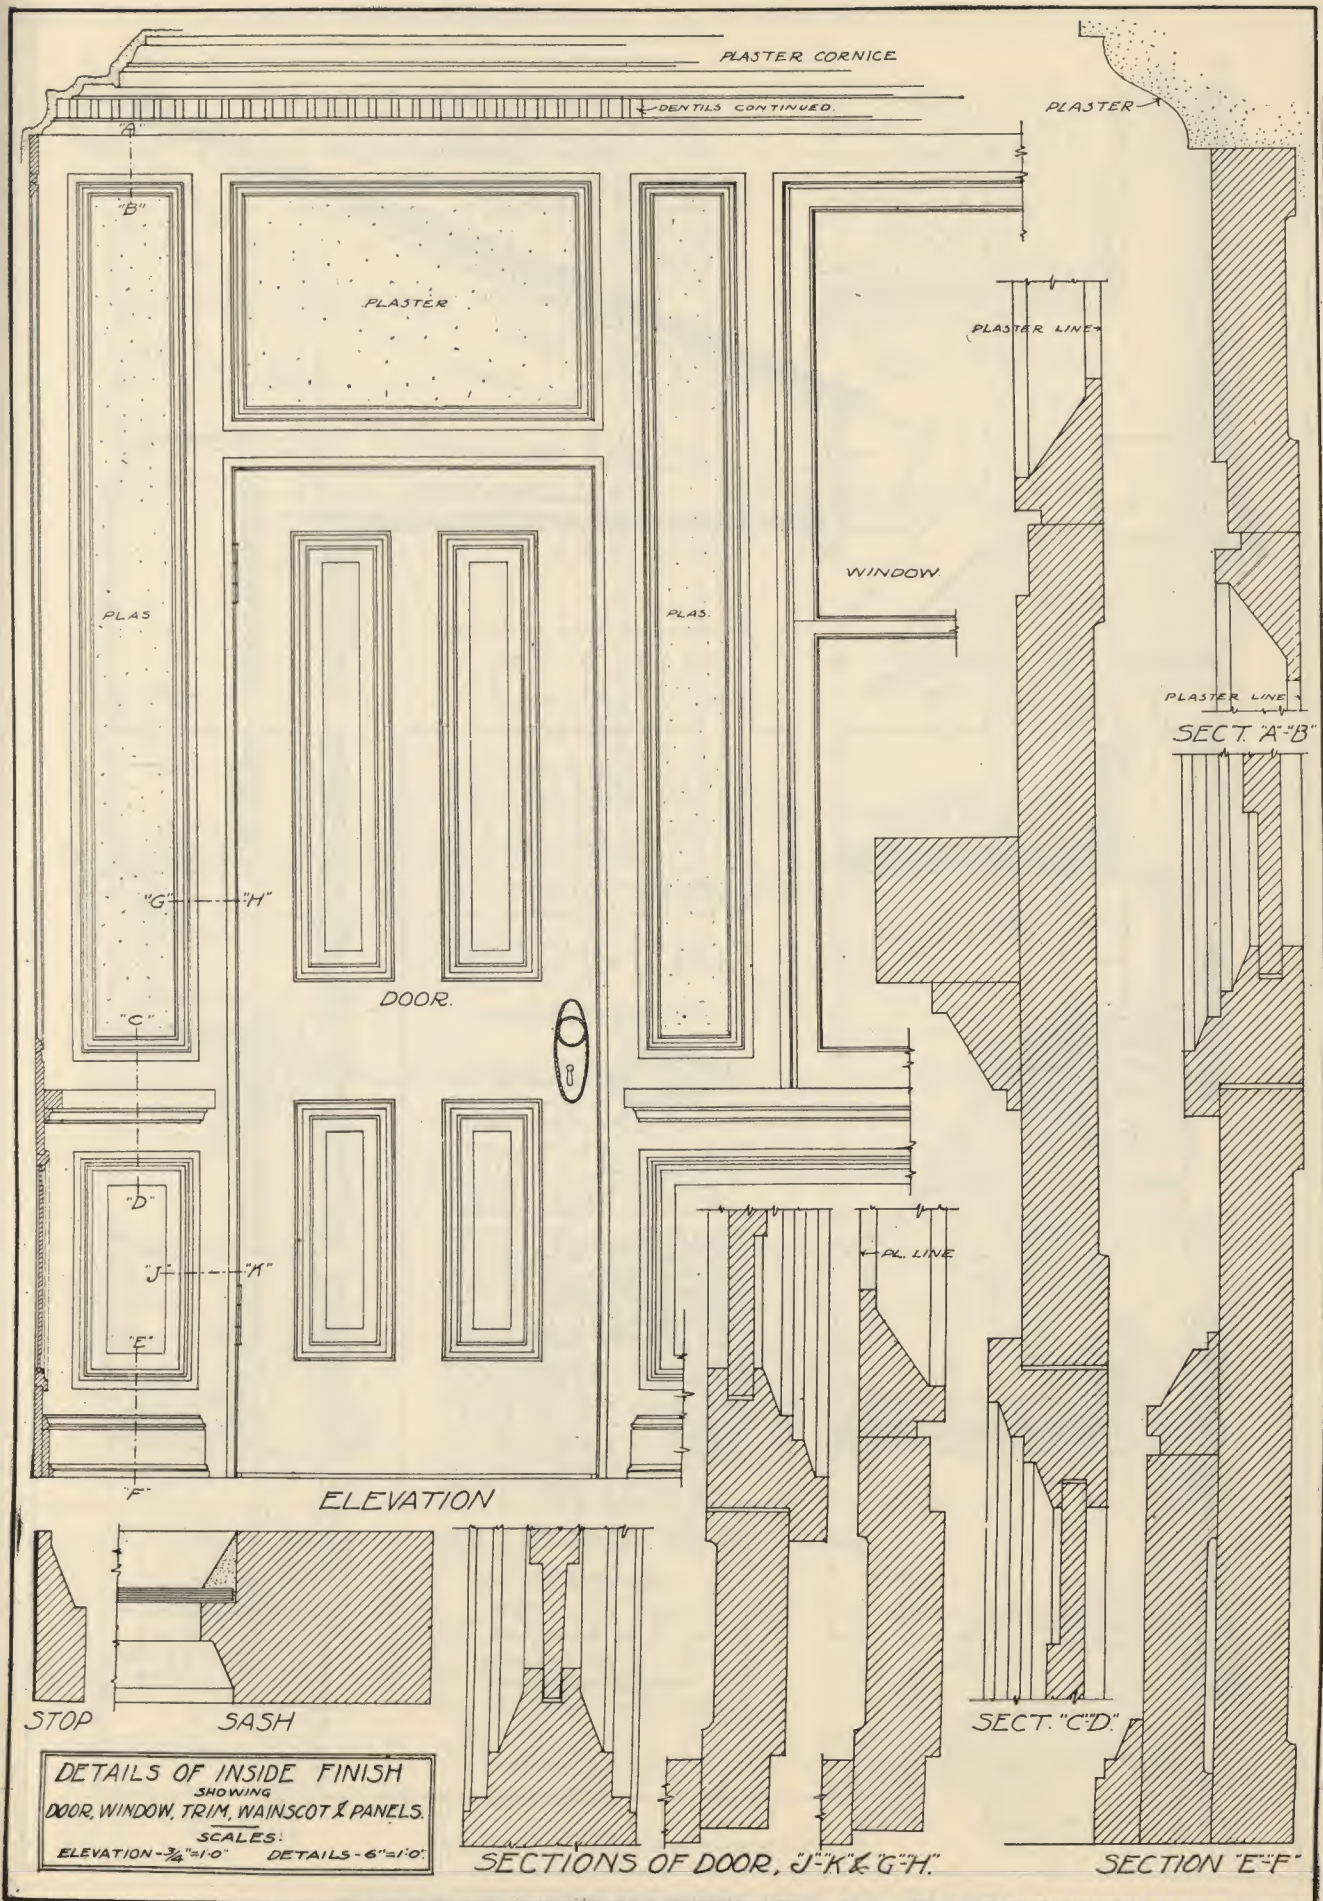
Plate VII. Elaborate Interior Trim Forming Wall Panels.
